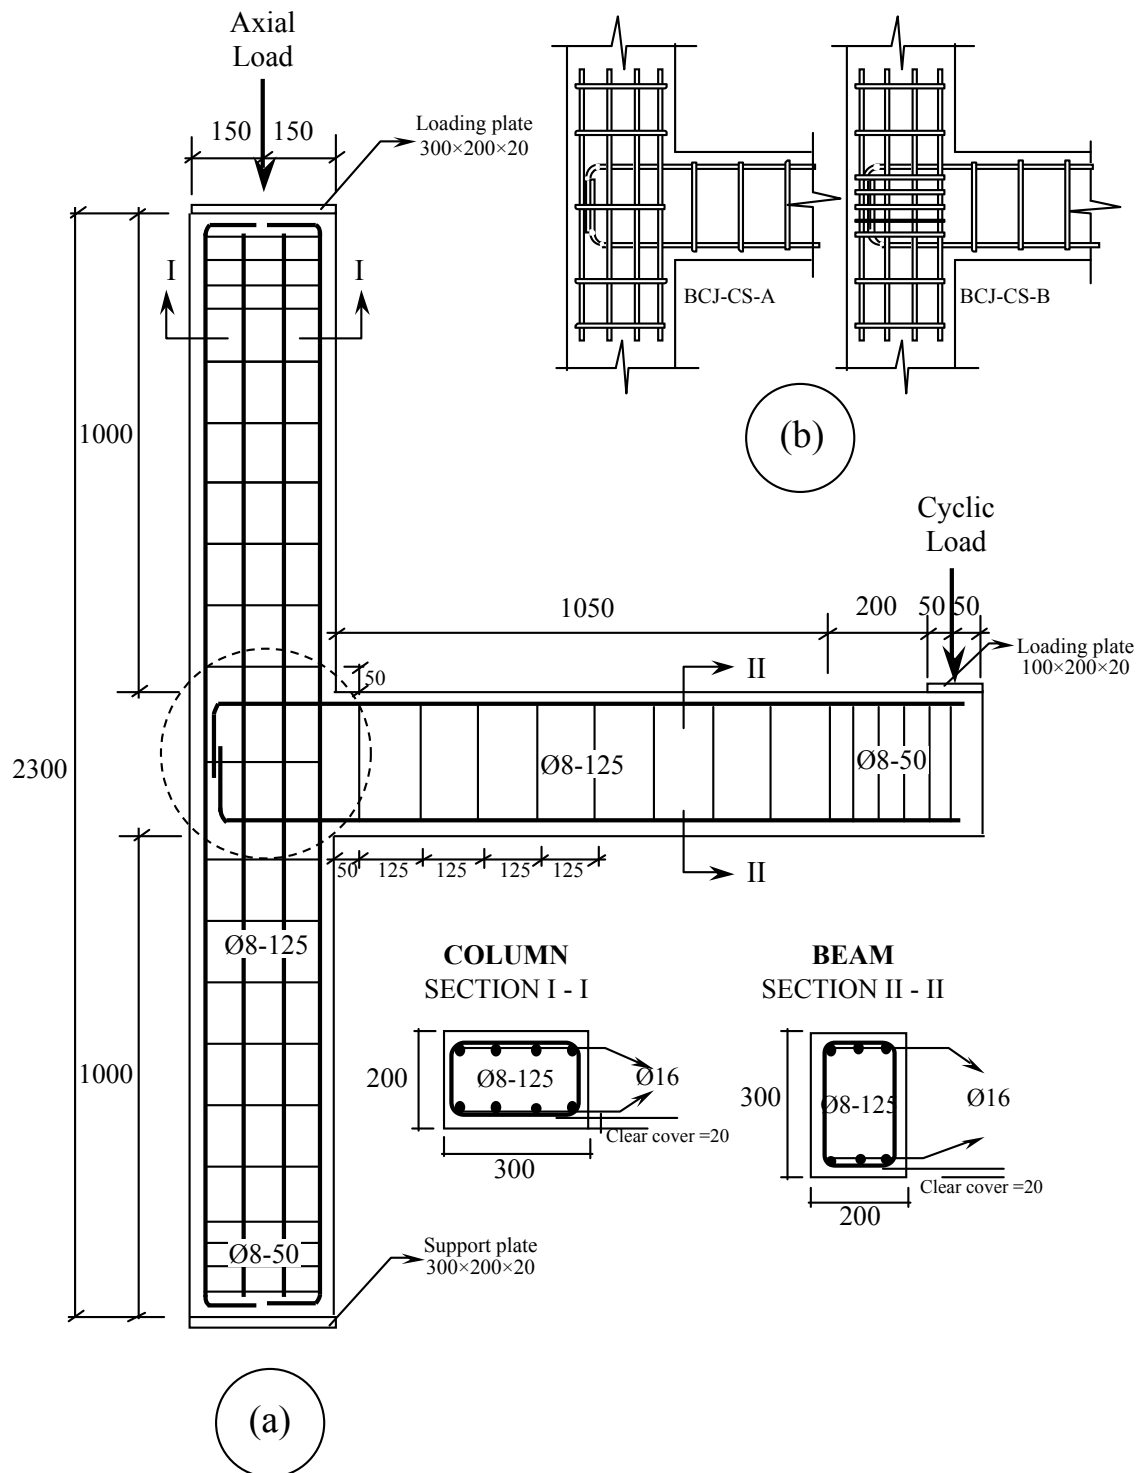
(a) Reinforcement details of the test specimens; (b) Shear reinforcement in the joint for BCJ-CS-A and BCJ-CS-B; unit in (mm)
